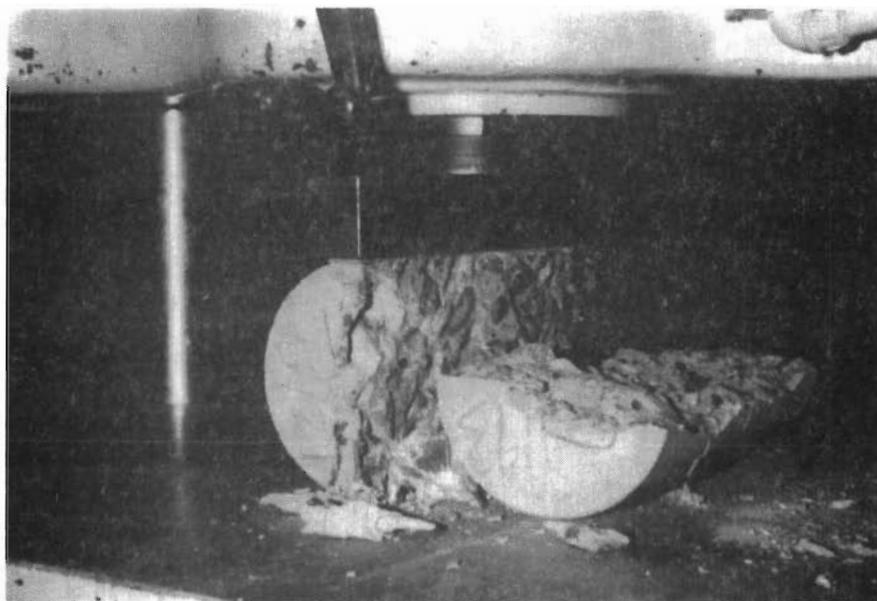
Typical fracture place of splitting tensile test specimen.
